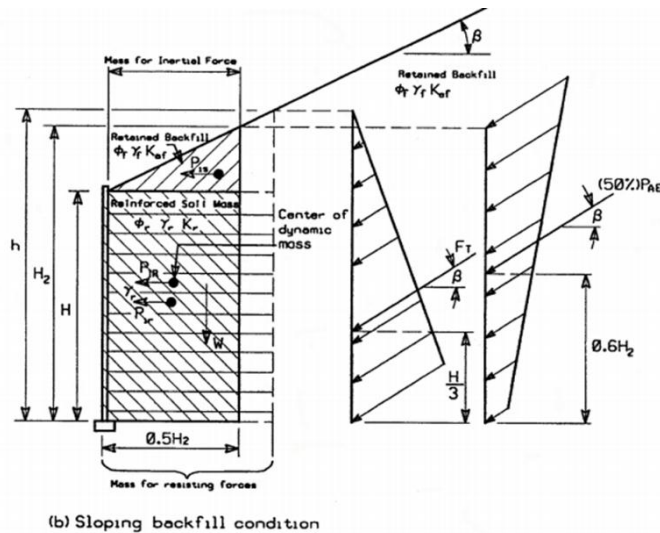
Seismic external stability of a GRS wall with sloping backfill in FHWA method.
